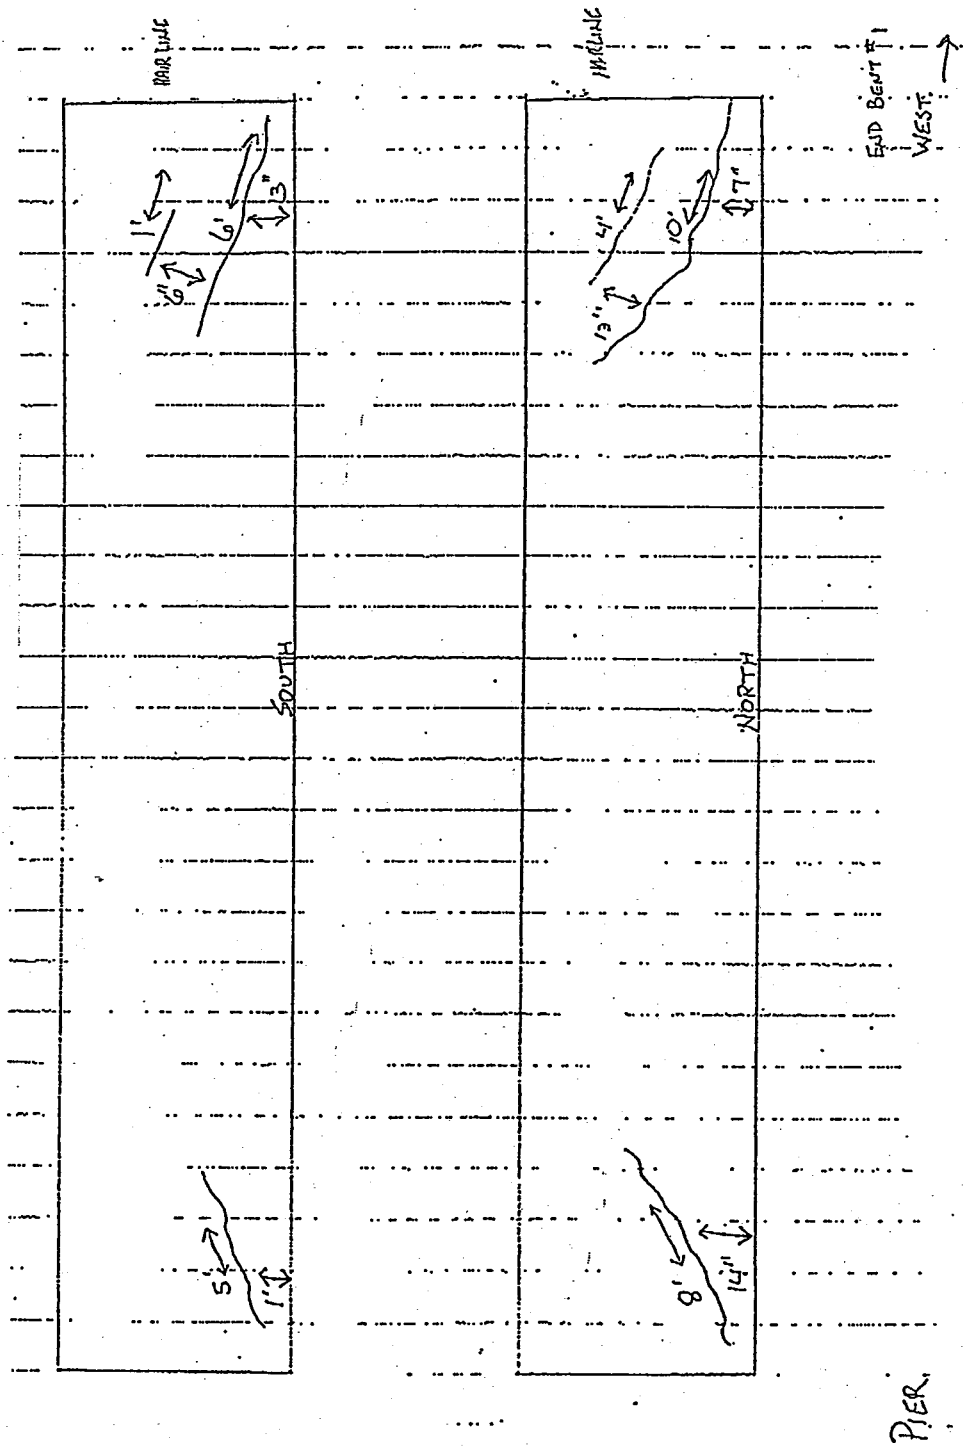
Crack of North Exterior Girder over I-75 SB
